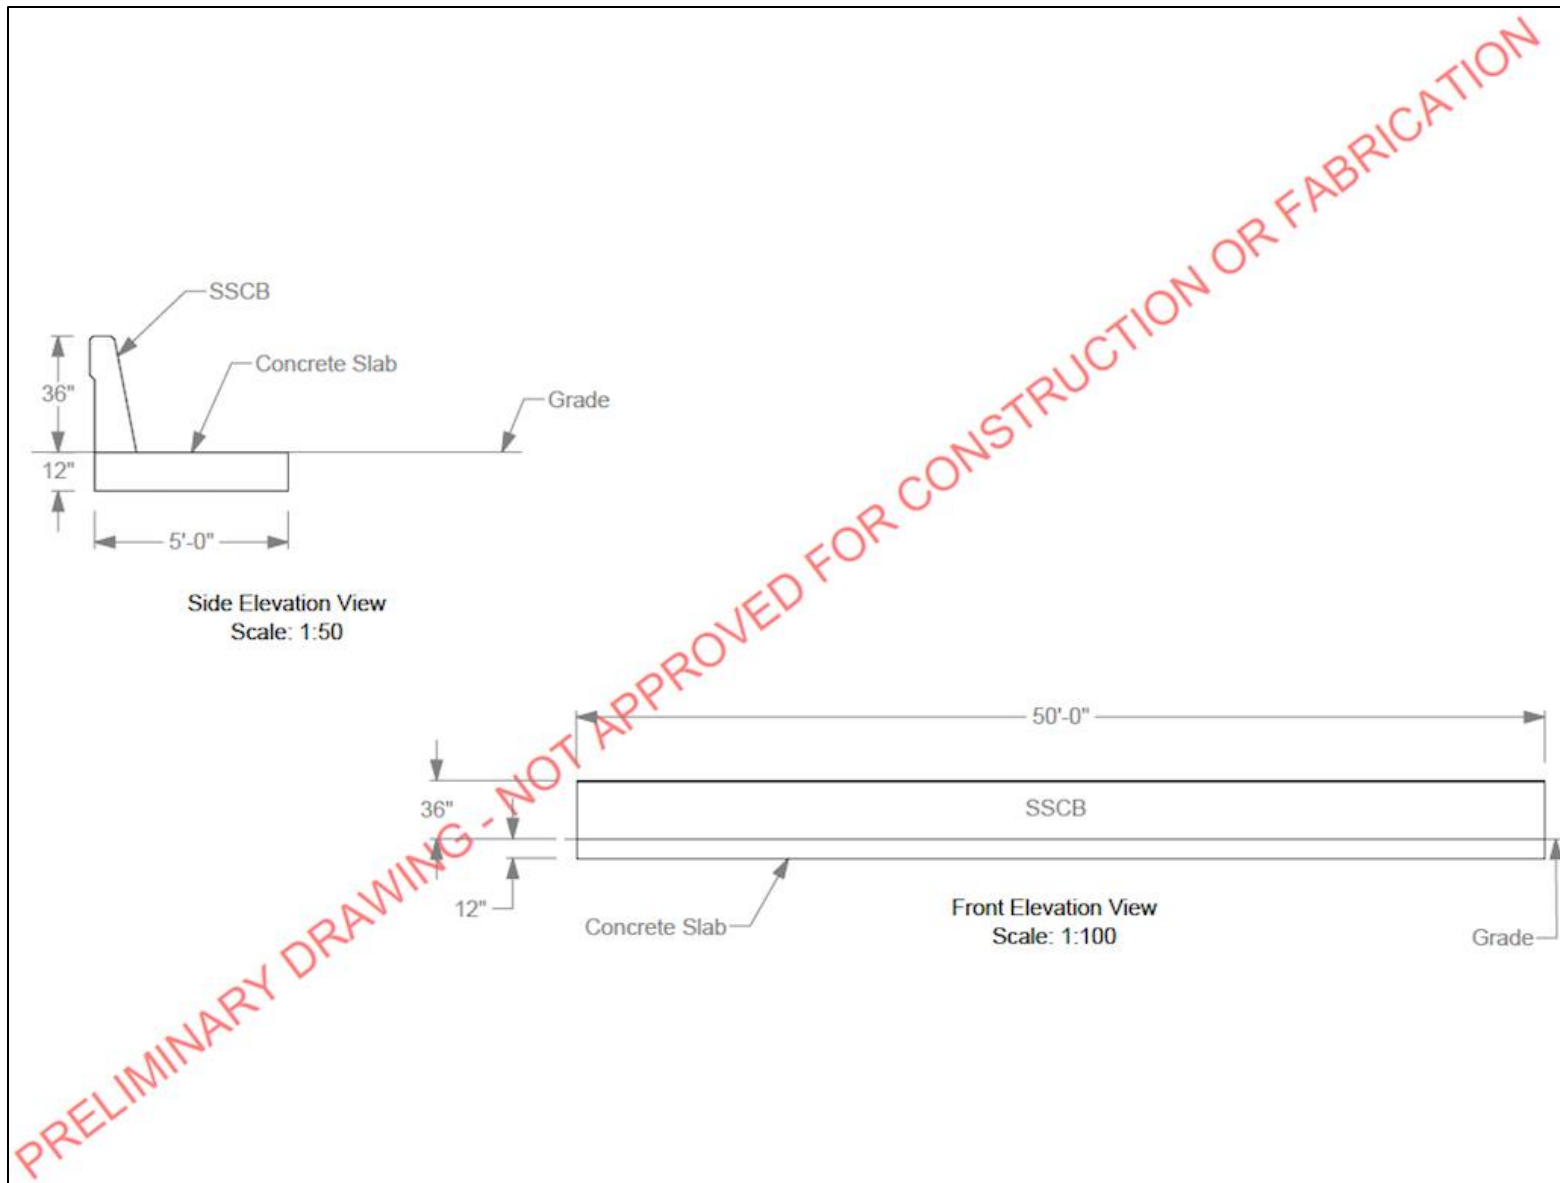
Design Concept 2 – Moment Slab Foundation (TTI, 2017)
